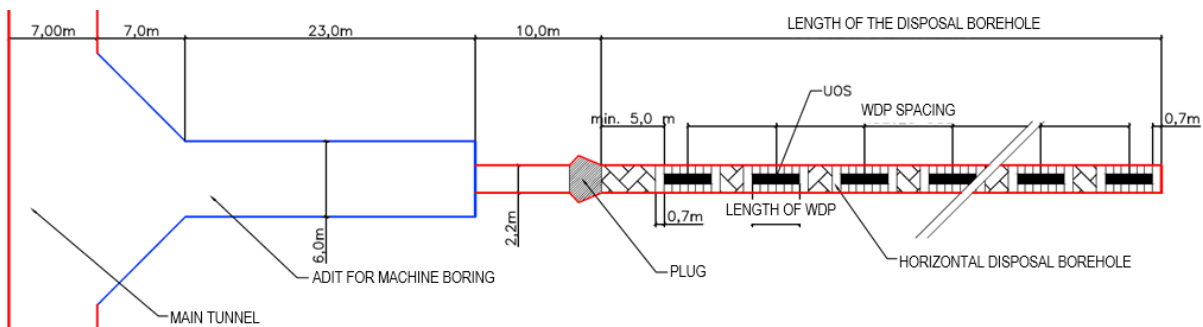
Schematic plan of horizontal disposal, prevailing mechanised excavation (D3 - HD, M) (Grunwald et al. 2018). Red lines = TBM tunnels, blue lines = D&B tunnels.
